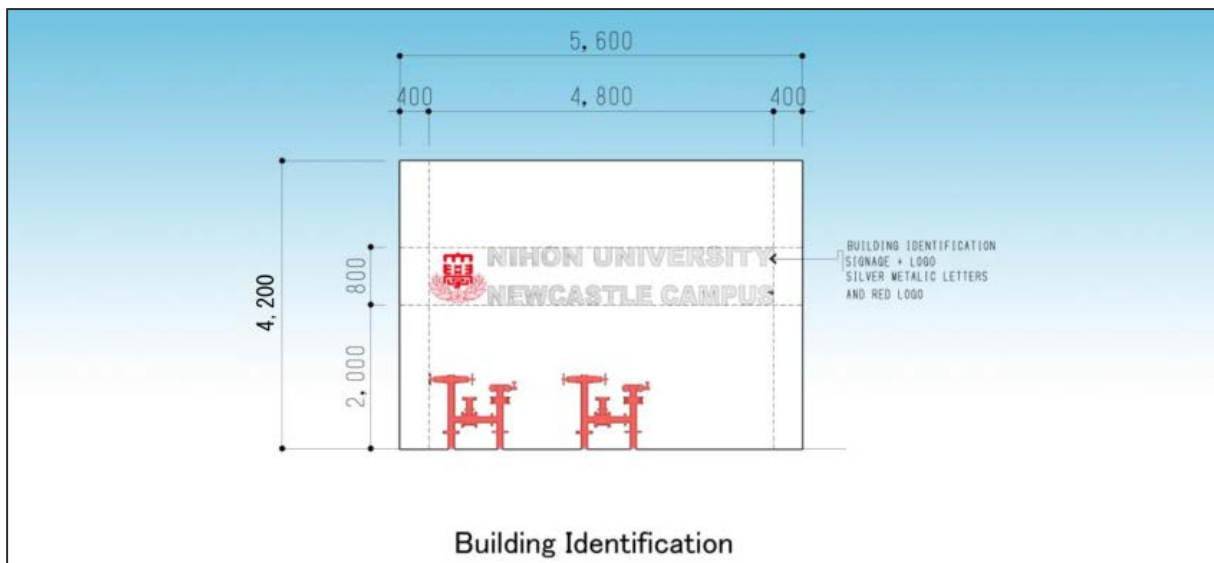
| Nihon University Building Identification Sign – Church Street Elevation (Source: EIS)
